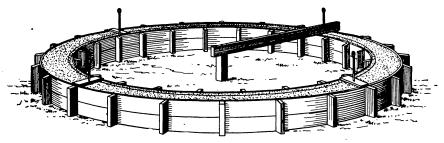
Form filled with concrete showing eyebolts and slats in place and circle to mark position of staves.
